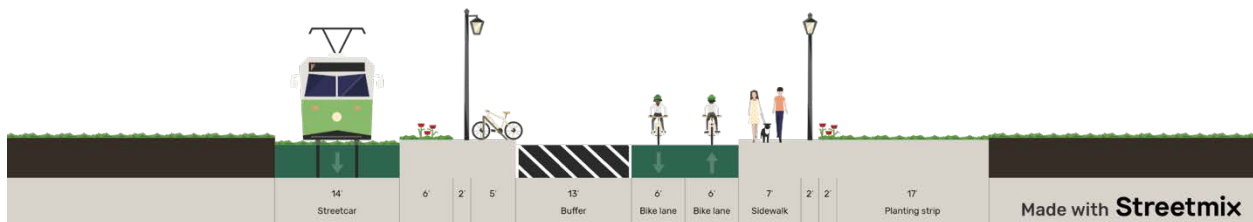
Proposed layout for Collat Avenue looking north from the baseball field. The new design includes pedestrian-scale lighting on both sides of the street, and a buffer zone for food trucks and other vehicles to park. The street will be closed off to through traffic, using removable barriers on either end. Diagram created in Streetmix by EC, 2022.
